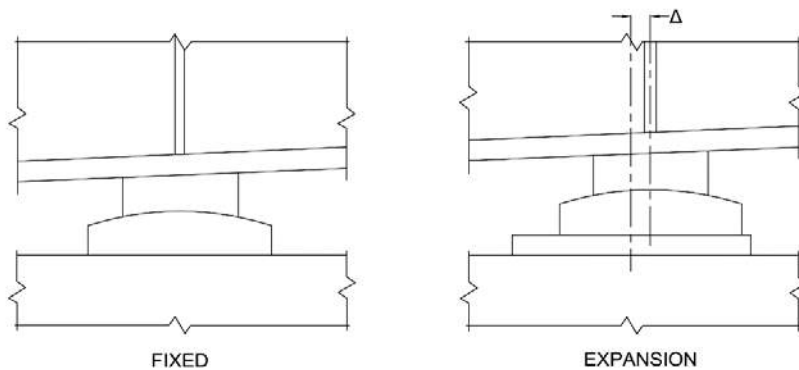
Steel Sliding Plate Bearings
